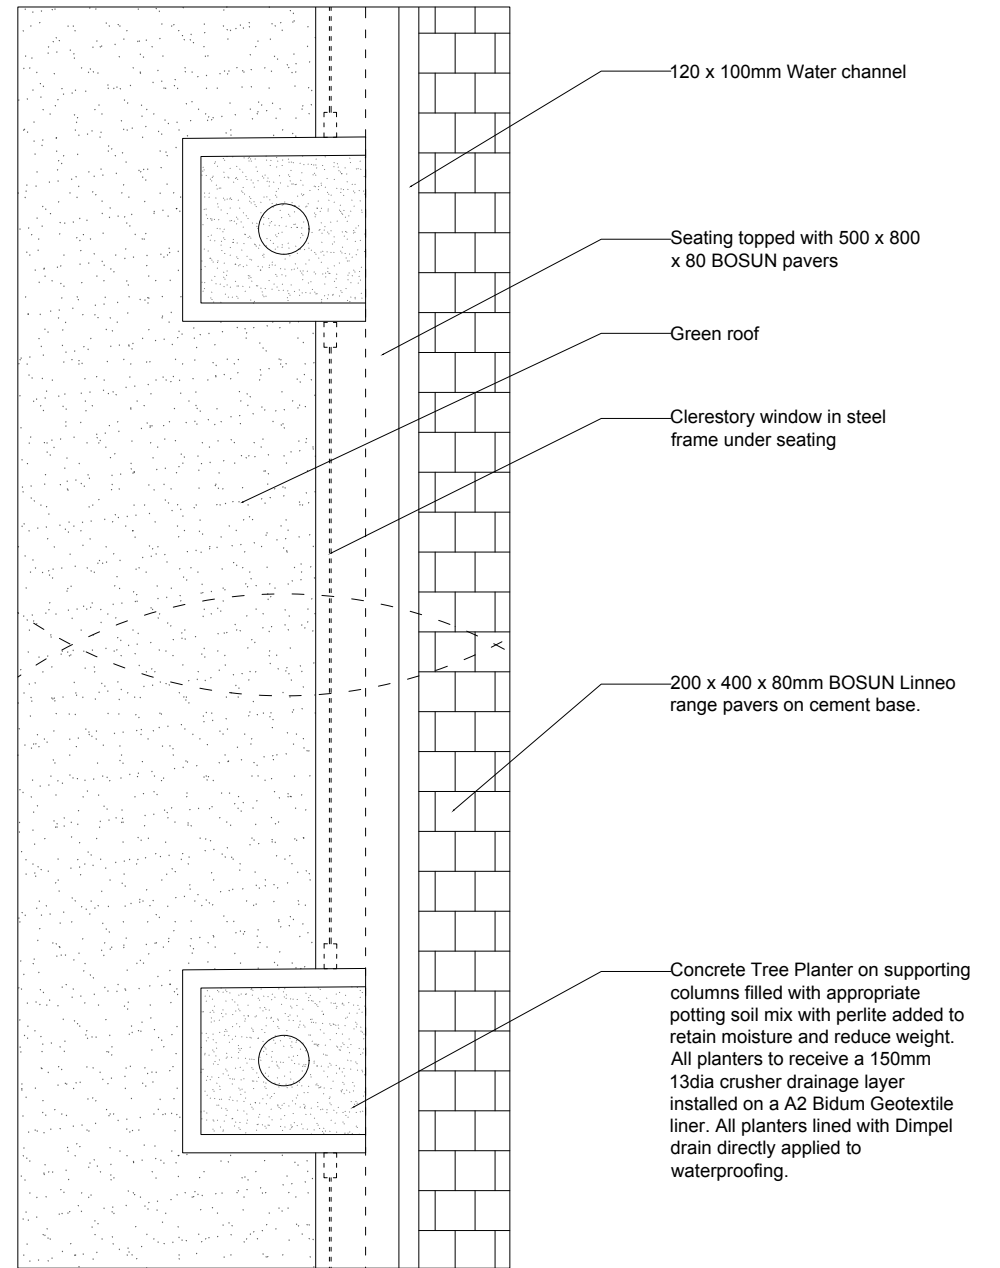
Paved walkway + clerestory window detail 7 (Author, 2020)
